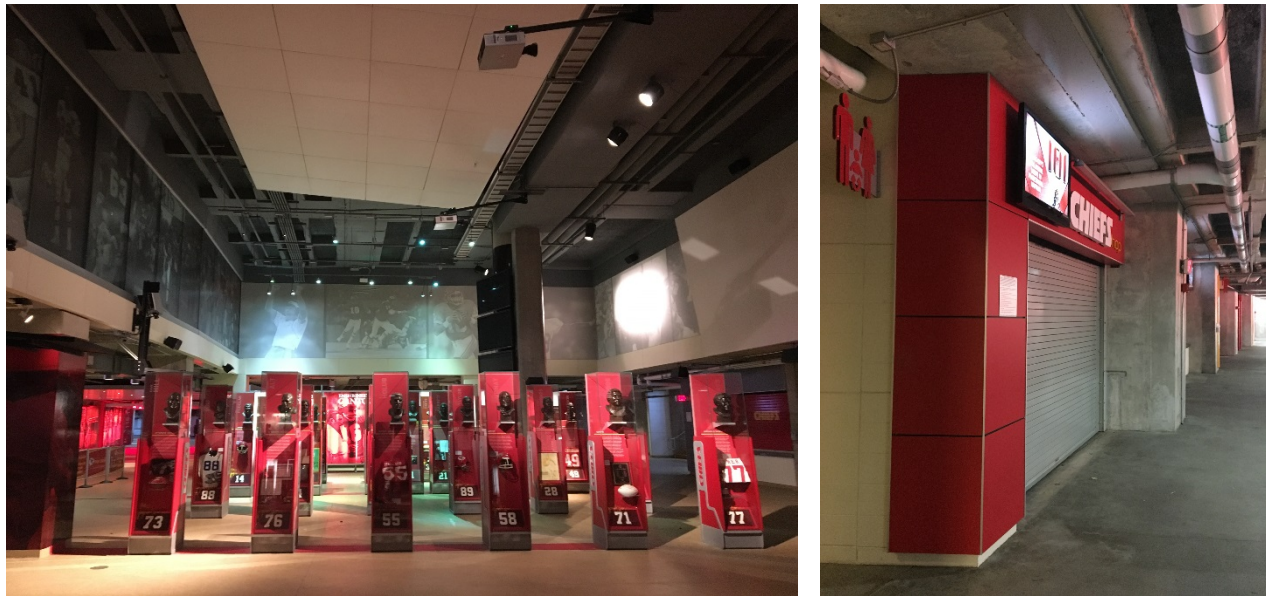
Epoxy Flooring (left) and Exposed Concrete (right) throughout Facility.
